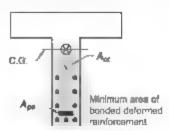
Area of minimum bonded deformed longitudinal reinforcement distribution
